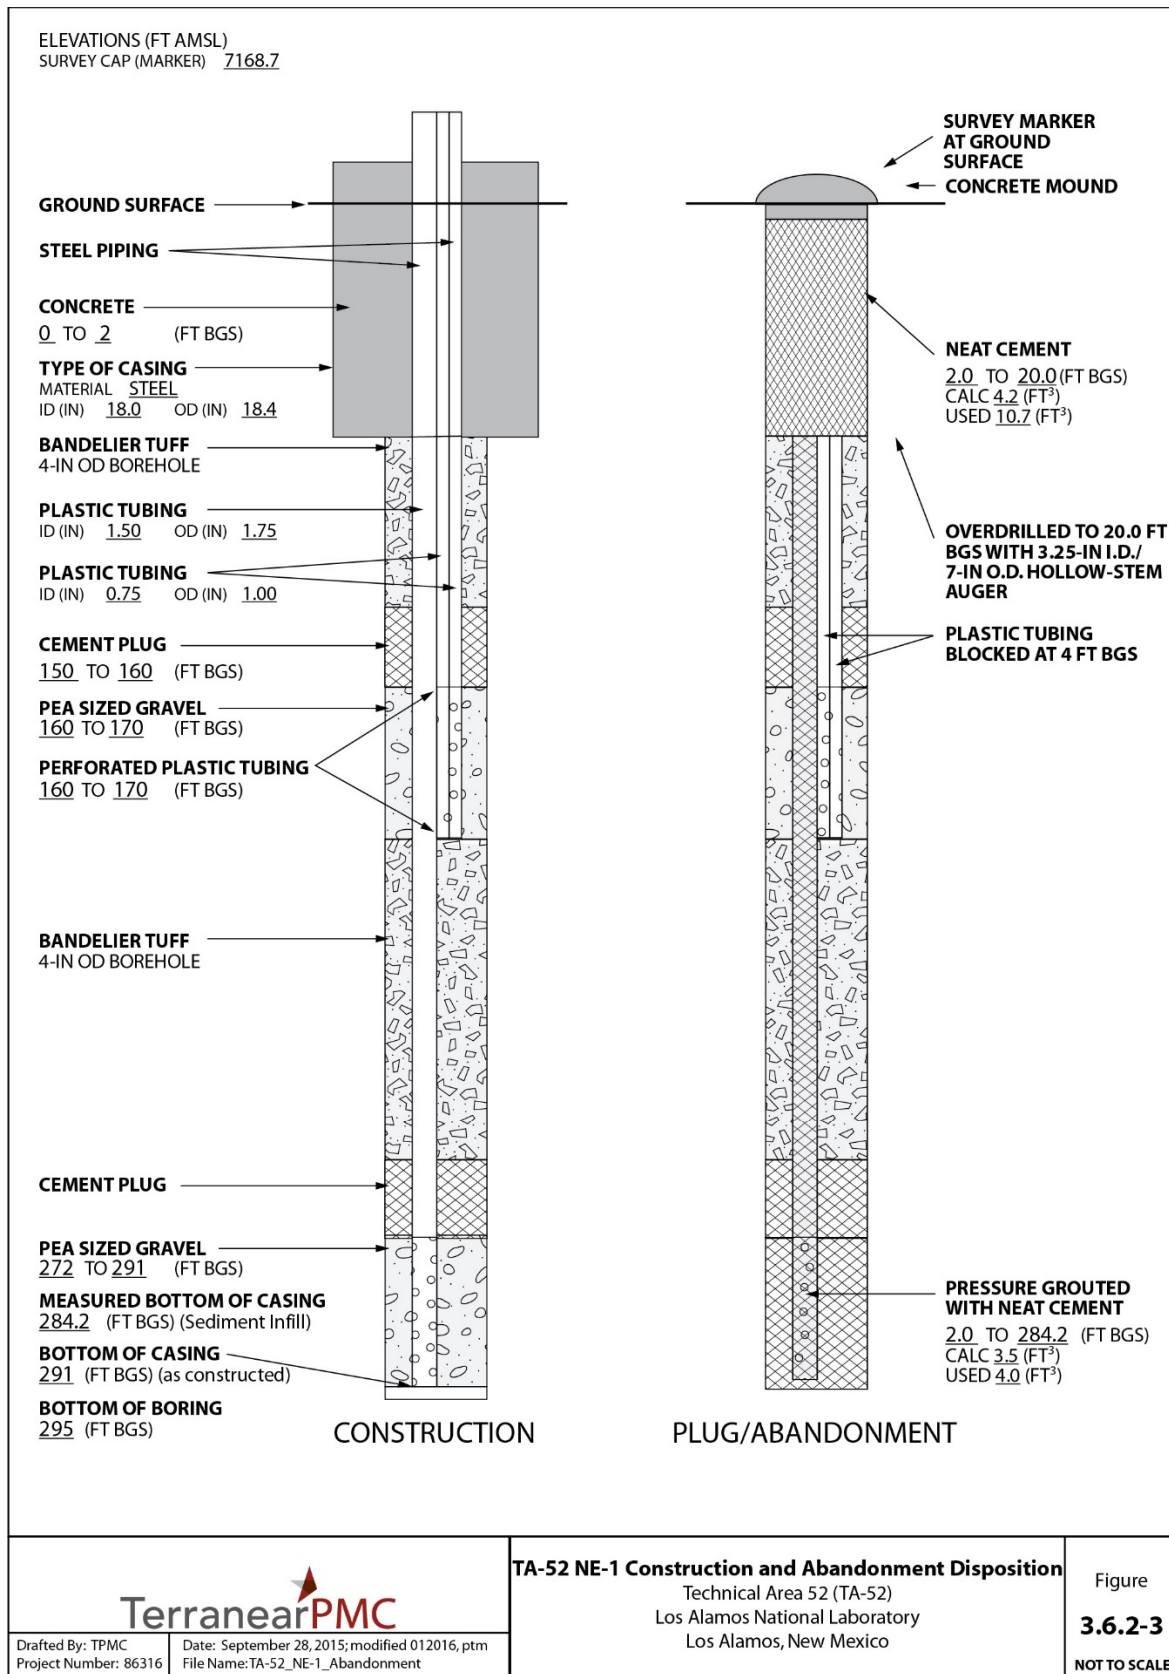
TA-52 Well NE-1 construction and abandonment disposition
